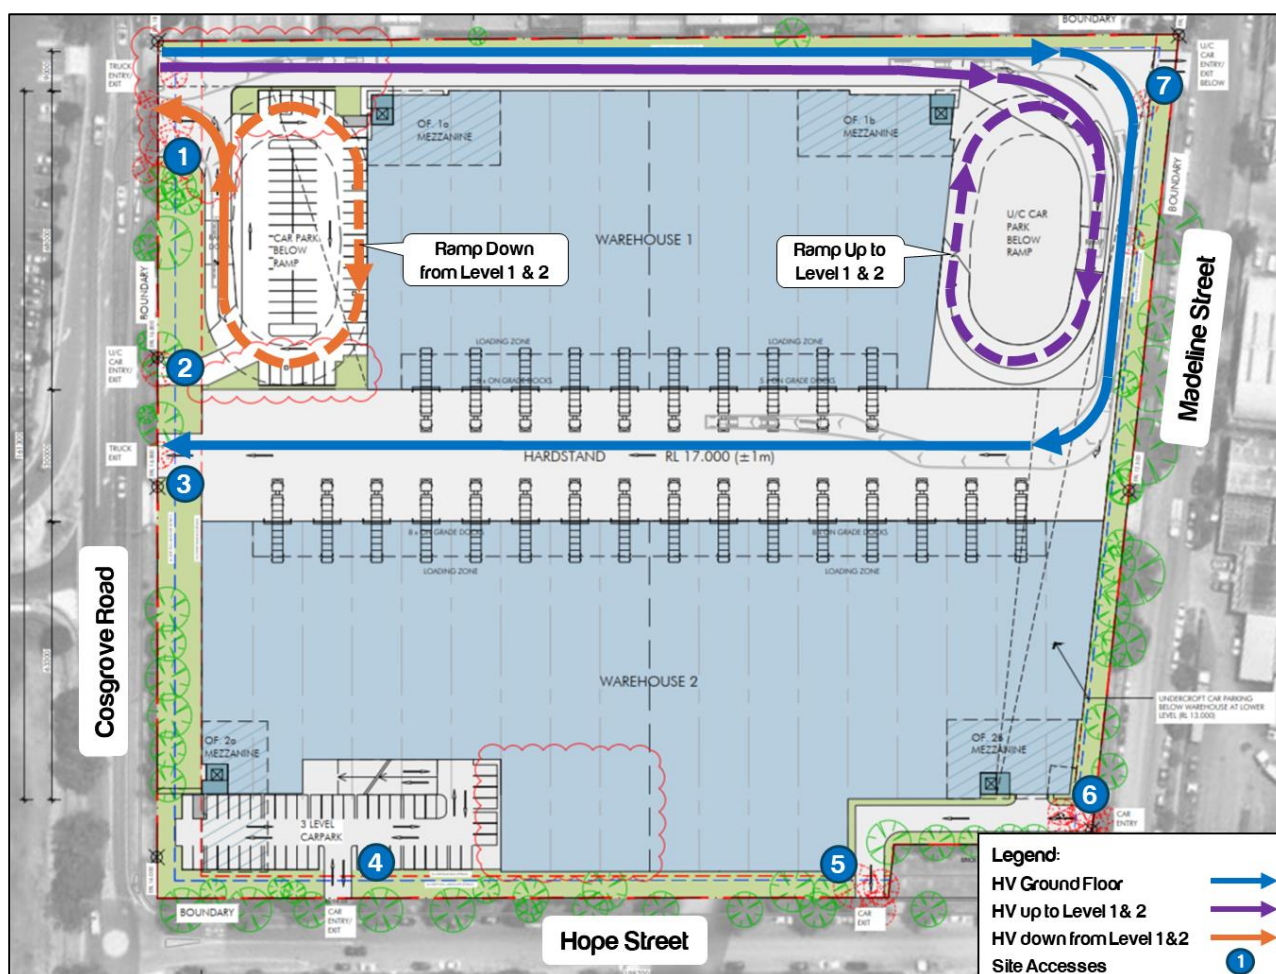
Heavy Vehicle Movement Plan – Ground Floor
